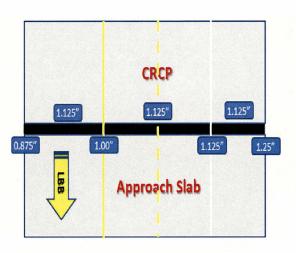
Joint widths at different locations of the expansion joint (West)
